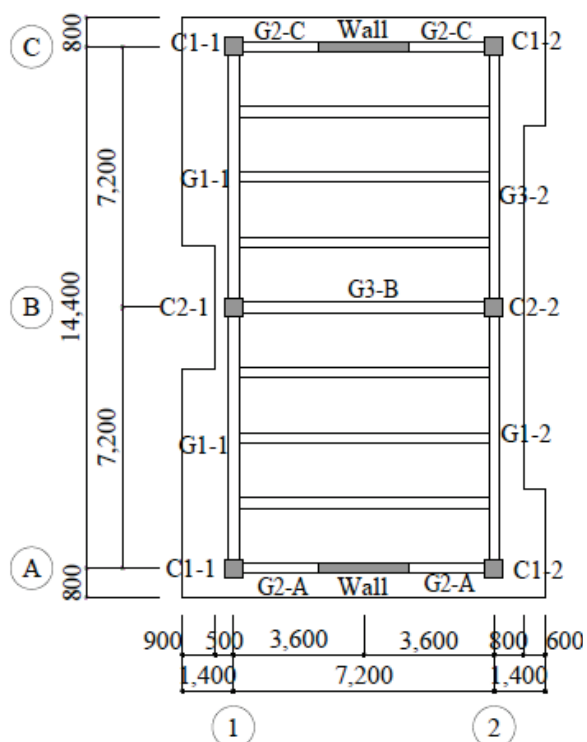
Typical floor plan and member nomenclature (measurements shown in mm) from Nagae et al. (2015).
